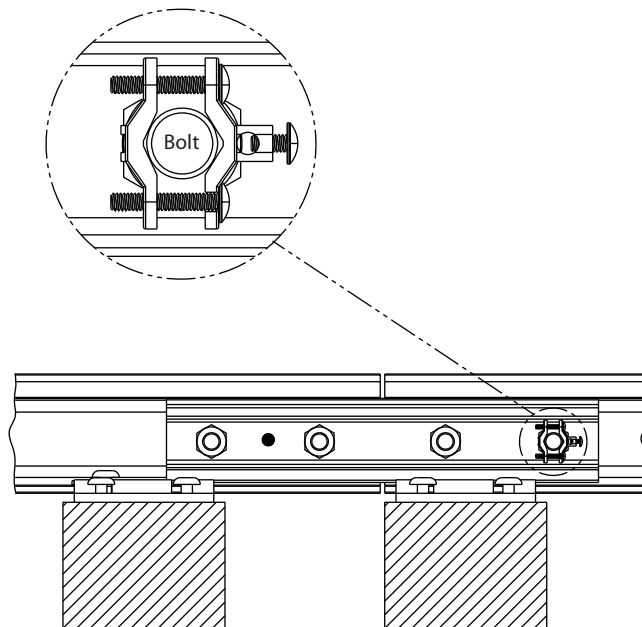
Ground Clamp Installed on Joint Bar Bolts
